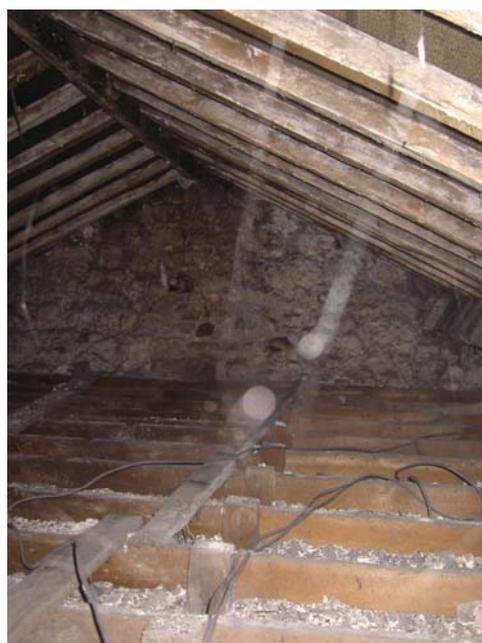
(left) King-post truss above Room F12b showing brick chimney stack to north-east
